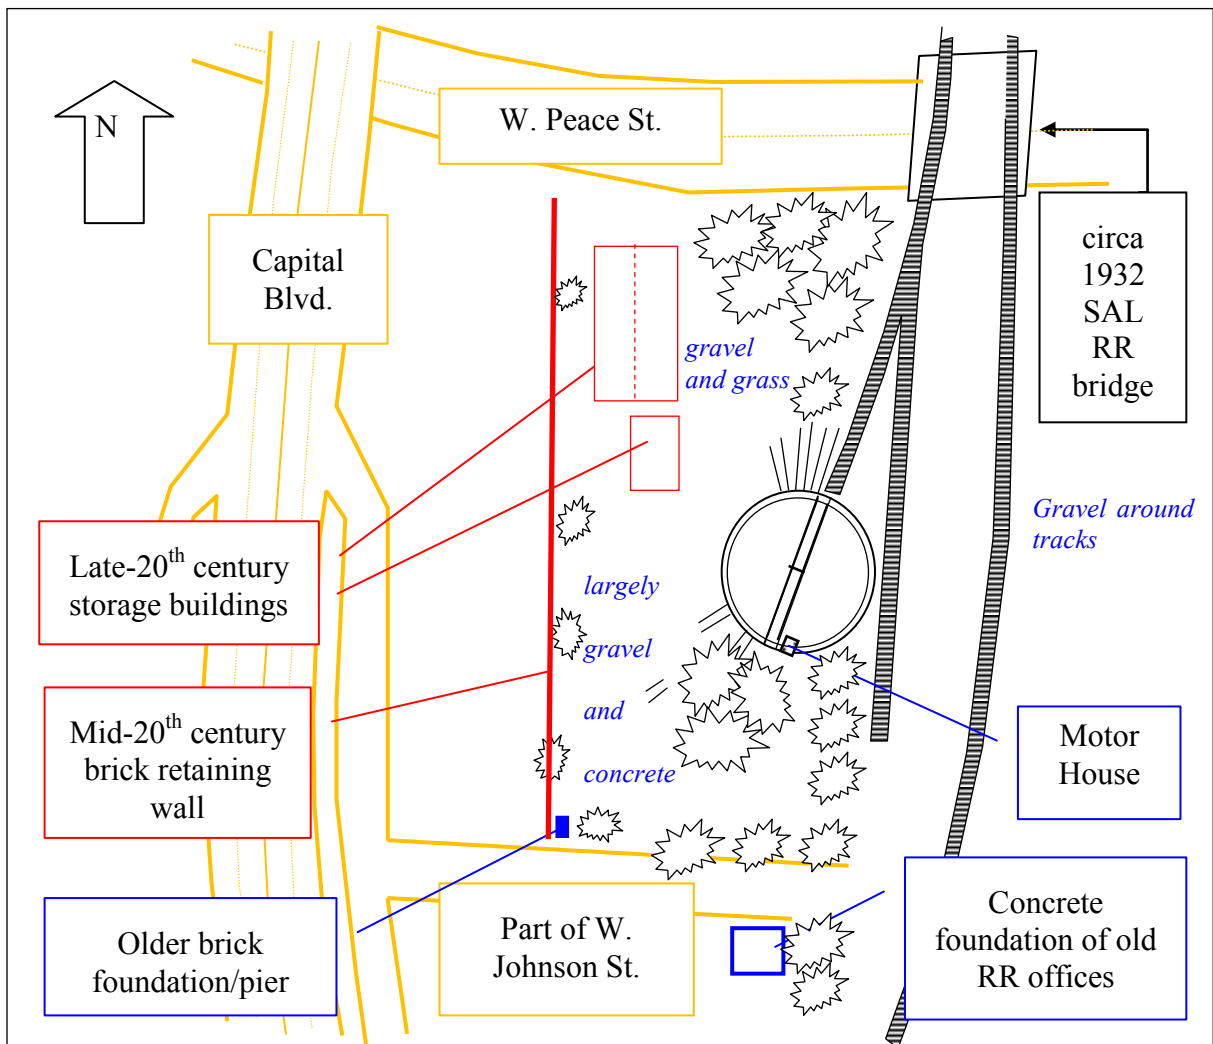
Site Plan of SAL Turntable and RGRR Roundhouse Site (WA 7383).
